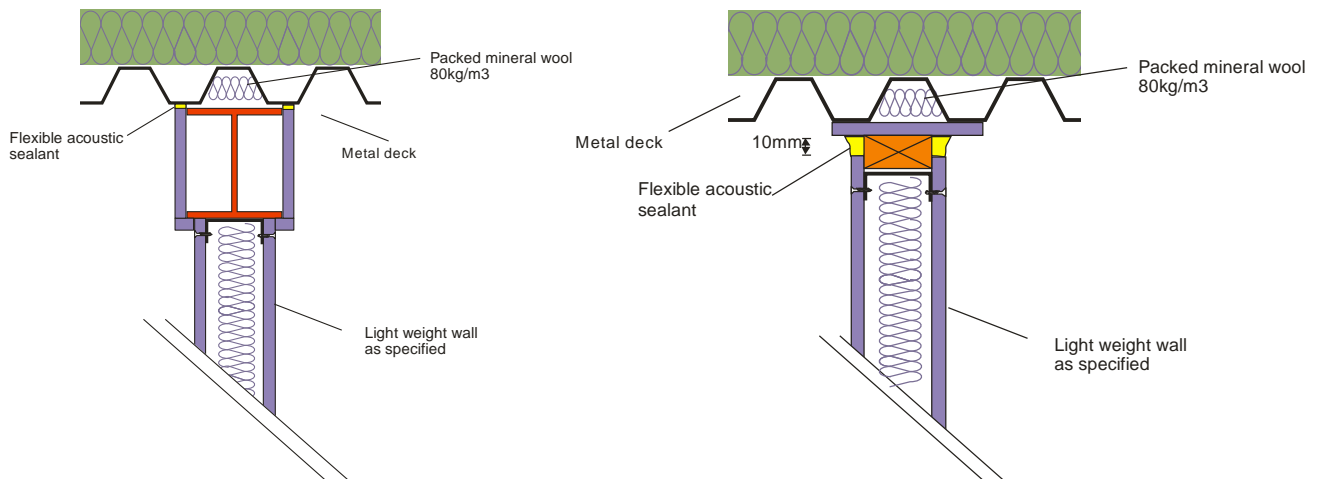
Head detail when the lightweight metal deck runs parallel to the wall (section view)
